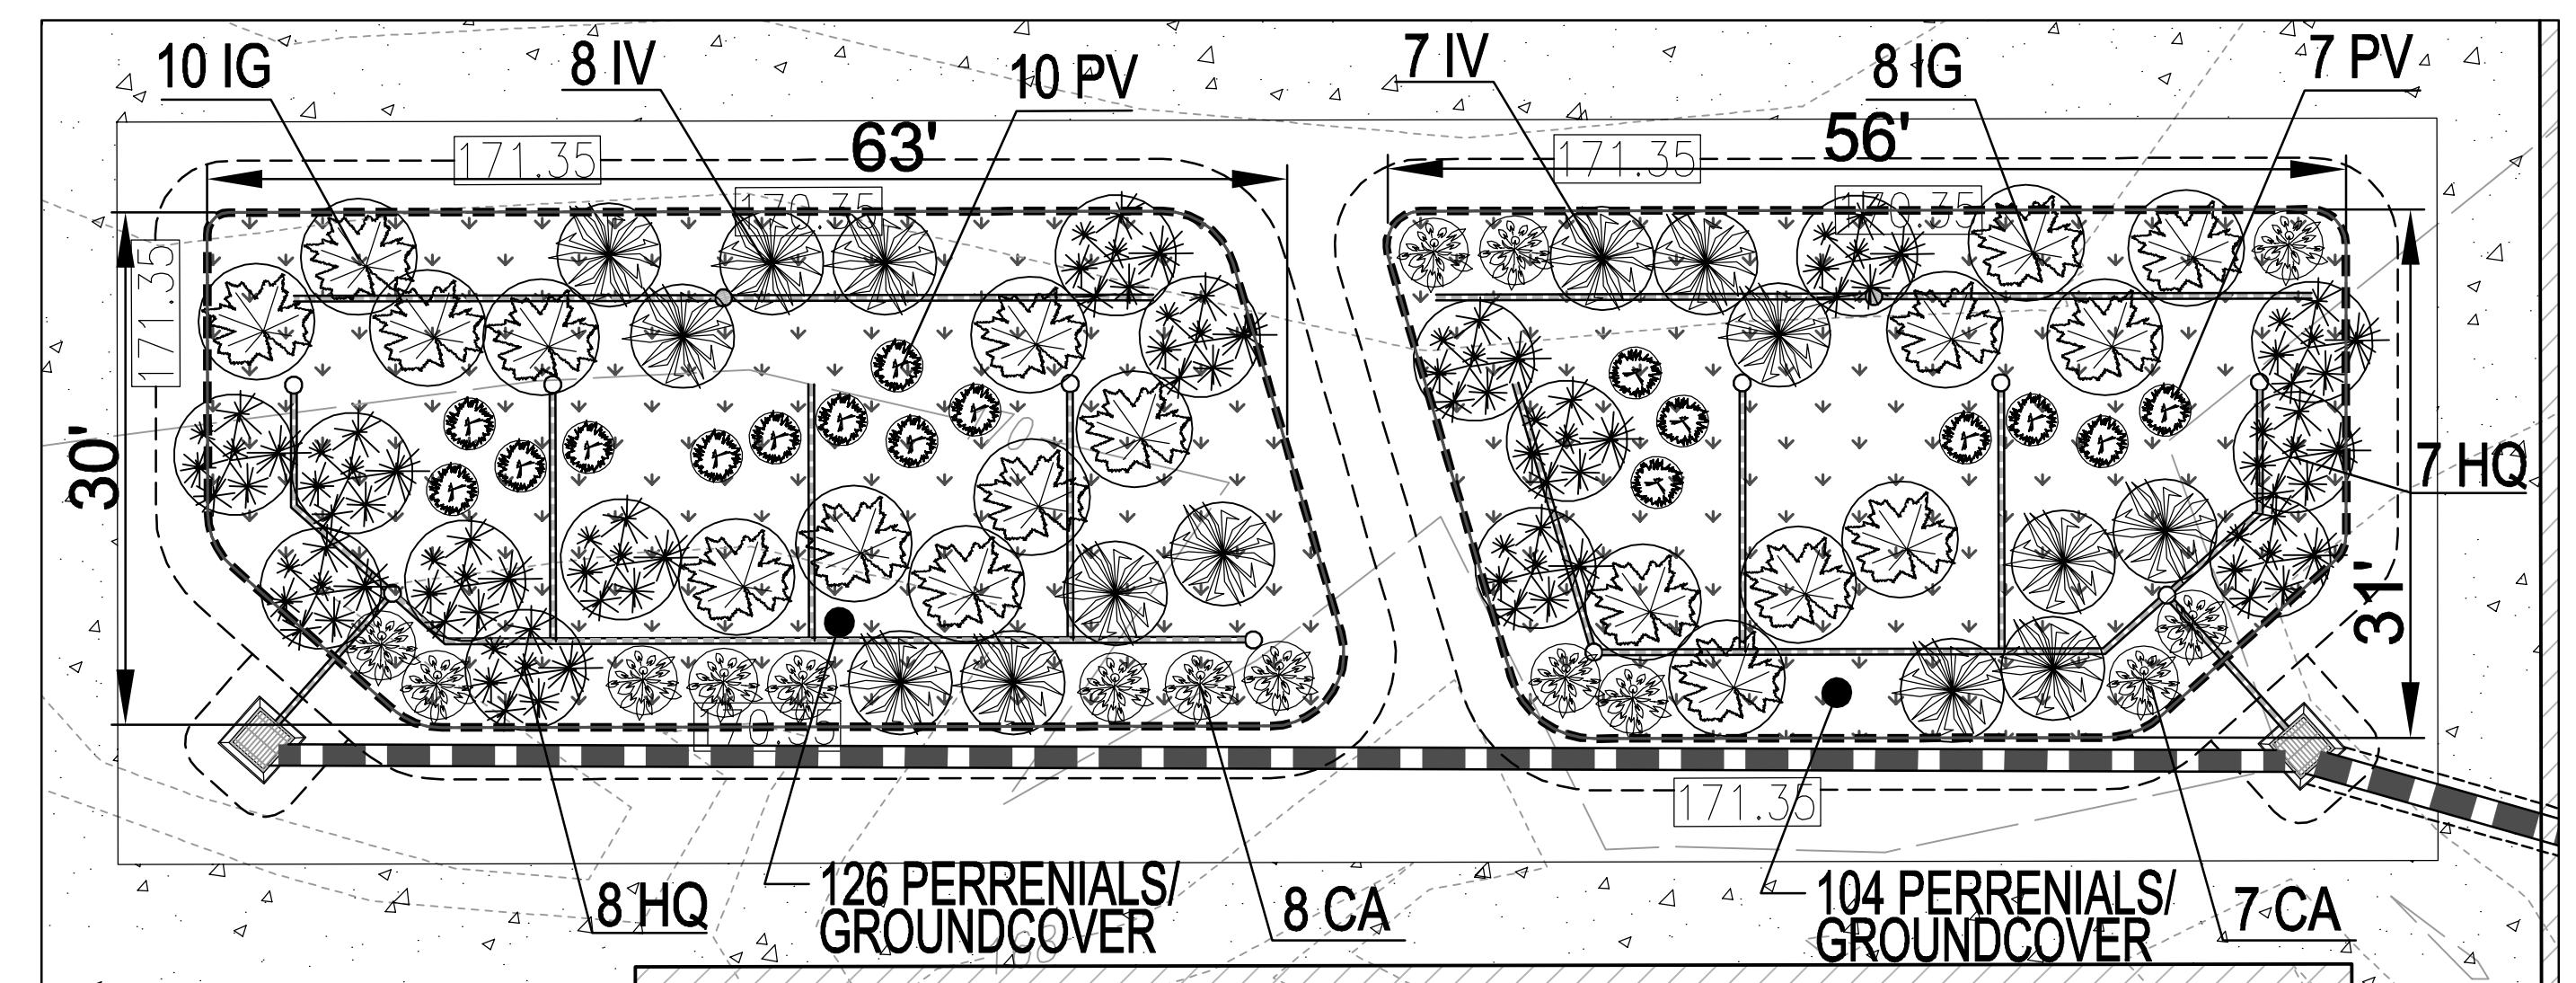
DETAILED BIO AND PLANTING PLAN (SWM #3)
